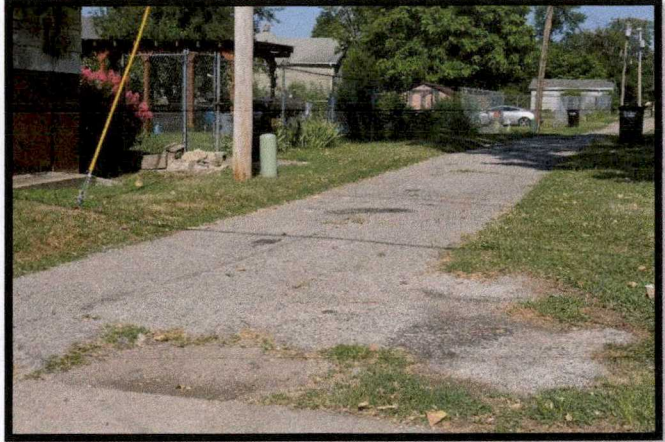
EPA Alley 46 (view northeast from Klein Street).
